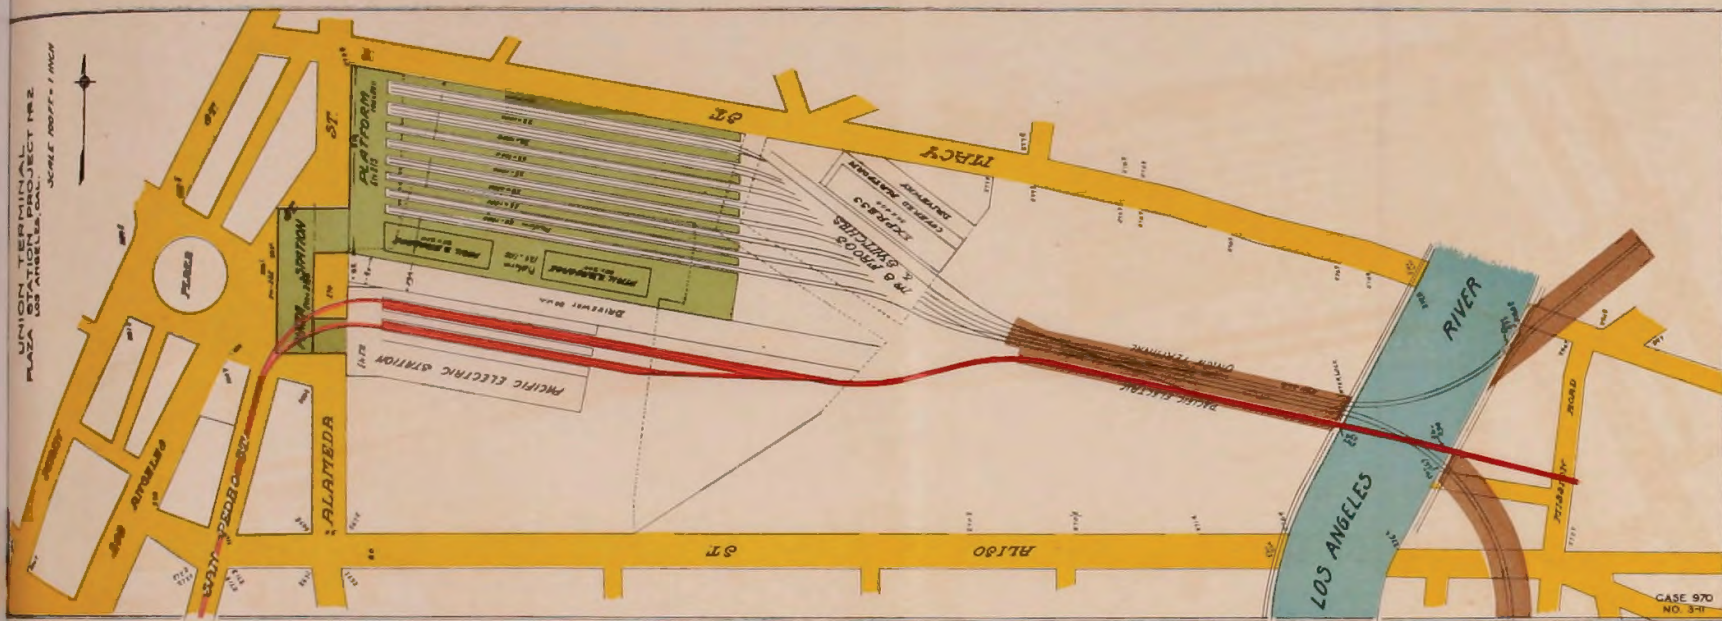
TRACK ARRANGEMENT FOR STORROWS PLAN
